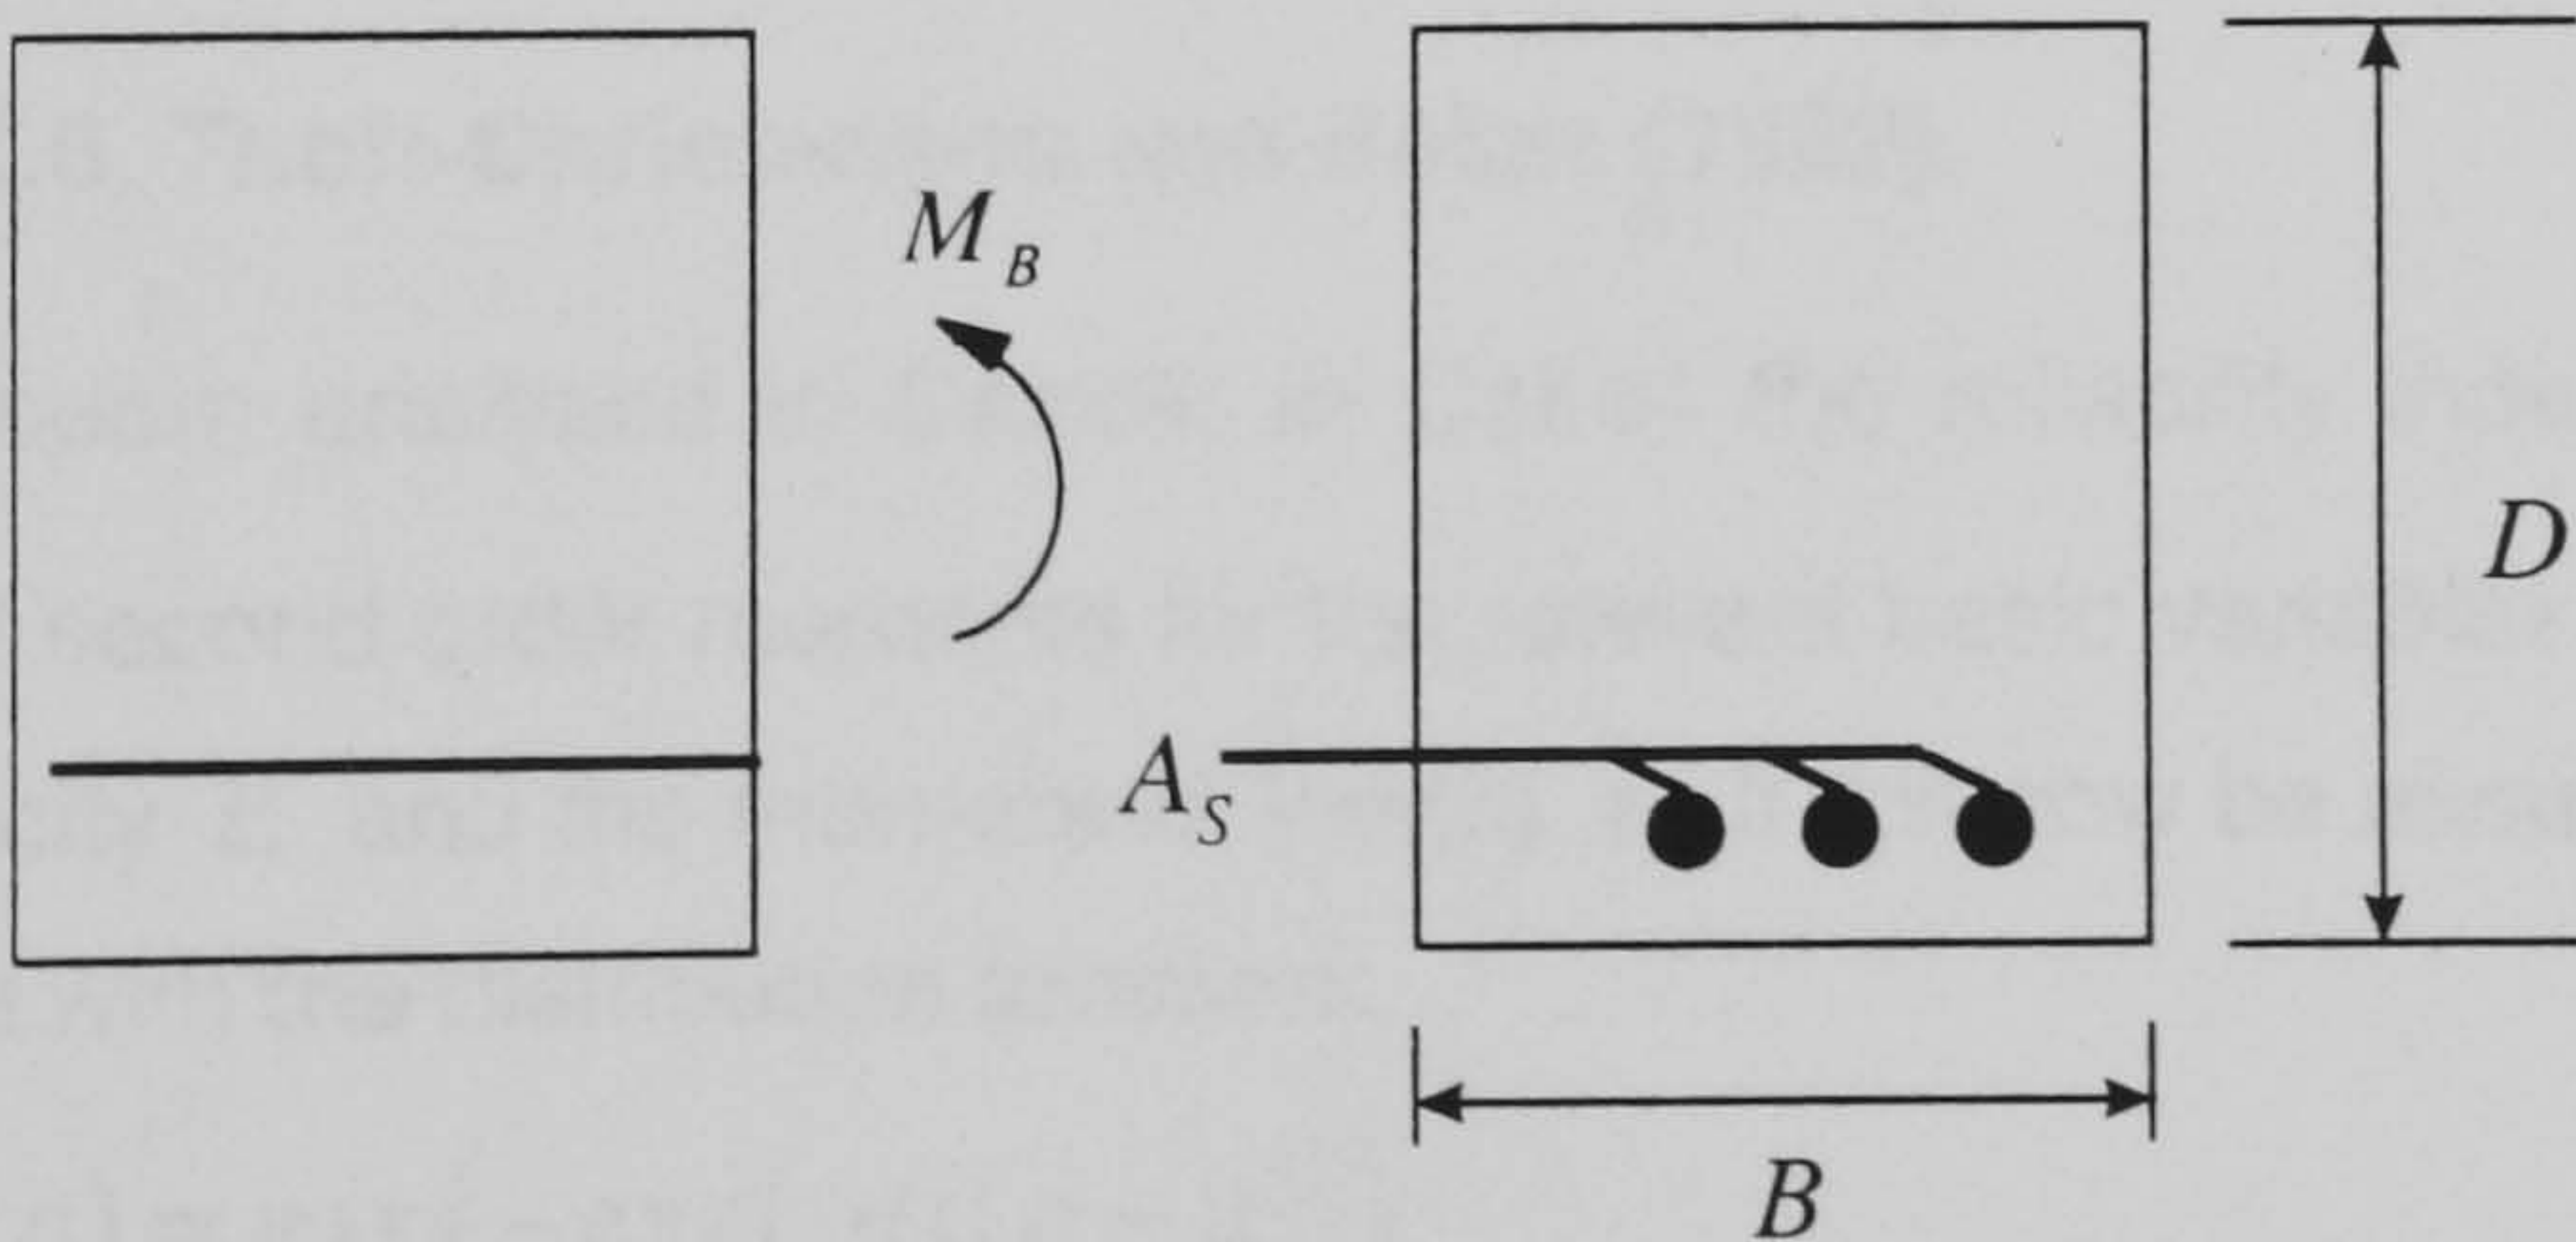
Reinforced concrete cross section subjected to pure bending, Case 3.
